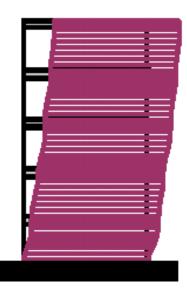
Open ground story buildings with masonry infills only in the upper stories are subject to severe deformation demands on ground story columns.
